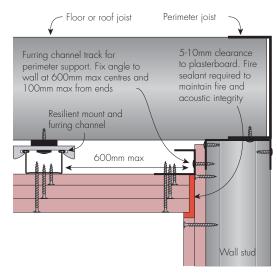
Fire Rated Ceiling to Wall -Alternate Detail
